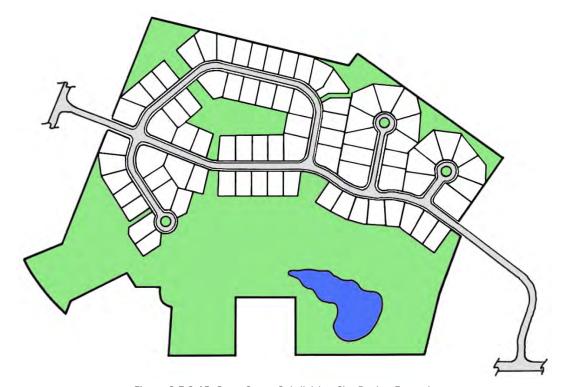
Open Space Subdivision Site Design Example
